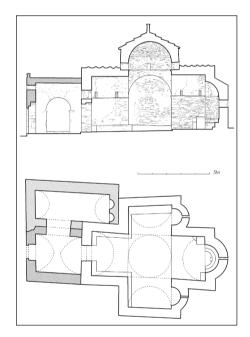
Agios Ioannis at Avlonitsa. Plan and longitudinal section (section based on drawing by G. Mastoropoulos).
